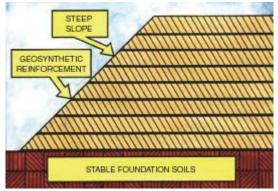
Soil reinforcement with geotextile Geotextile is placed under a soil layer and then folded back over the top before the next soil layer is placed
